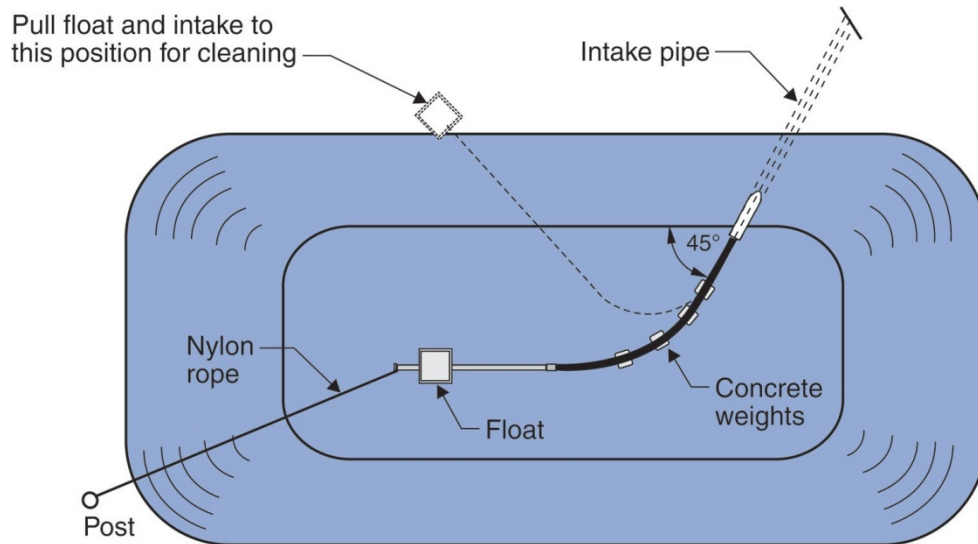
Plan View of Intake System shows a plan view of a dugout and the intake installation. The intake pipe should enter the dugout on a 45 degree angle to reduce the chances of kinking when the intake is pulled to shore for maintenance.
